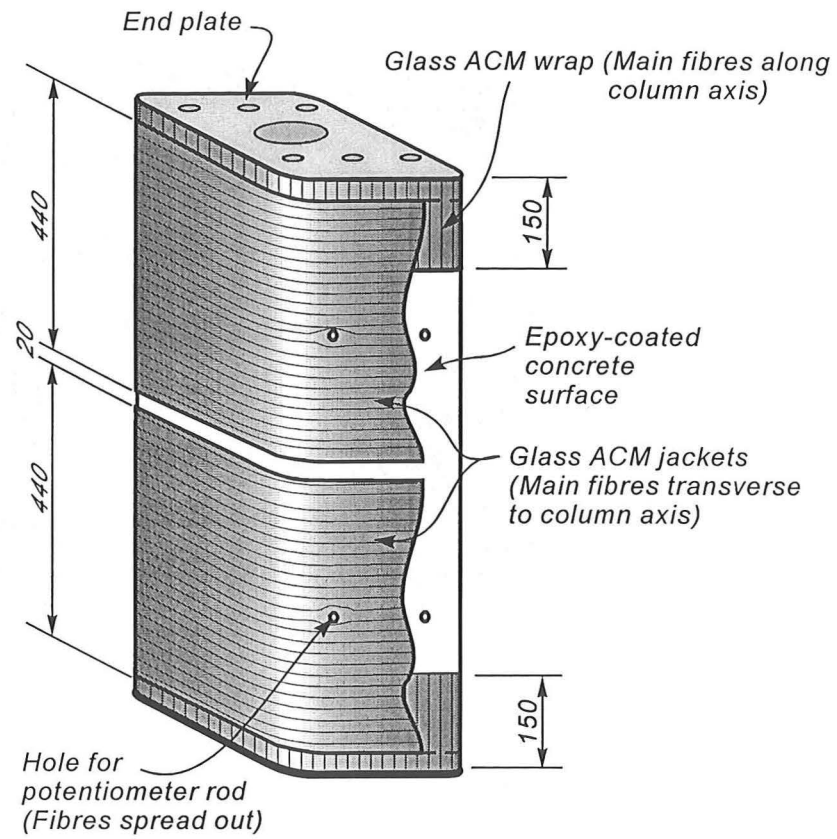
Detailed Arrangement of Glass ACM Jackets
